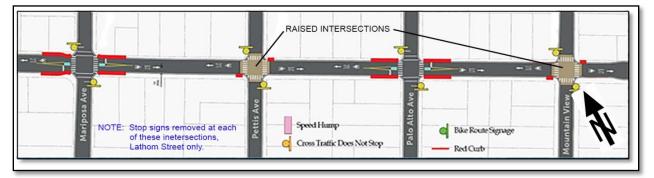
Mariposa Avenue to Mountain View Avenue Proposed Improvements
